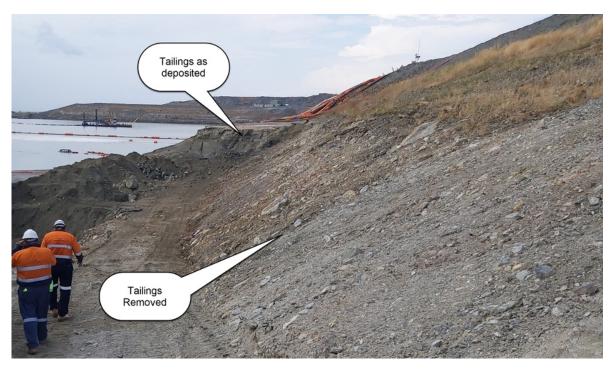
Cleaning remnant tailings from walls of tailings storage facility (2020)
